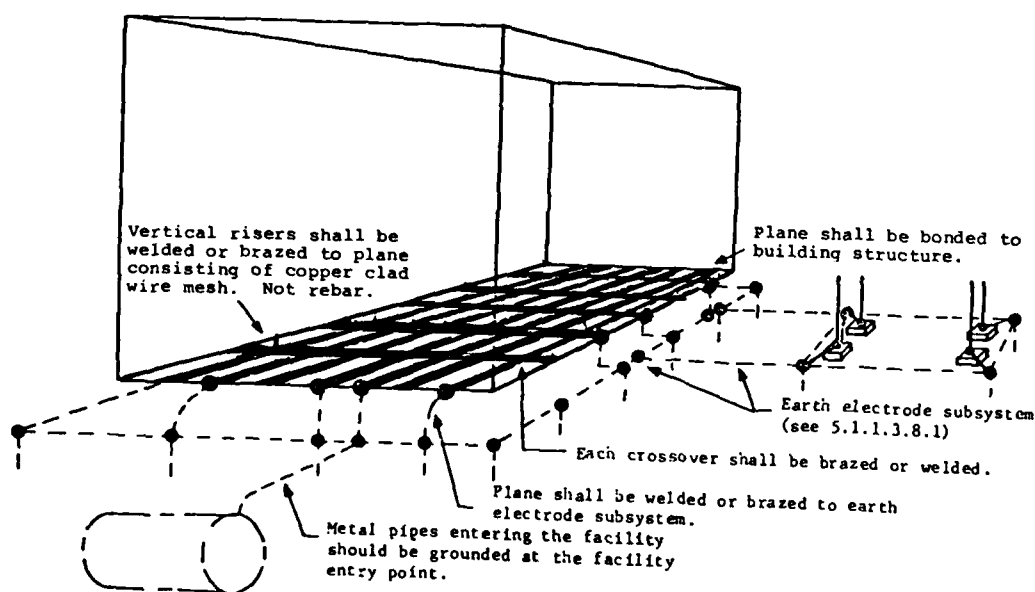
Example of Equipotential Plane to Earth Electrode Subsystem (for New Construction)
